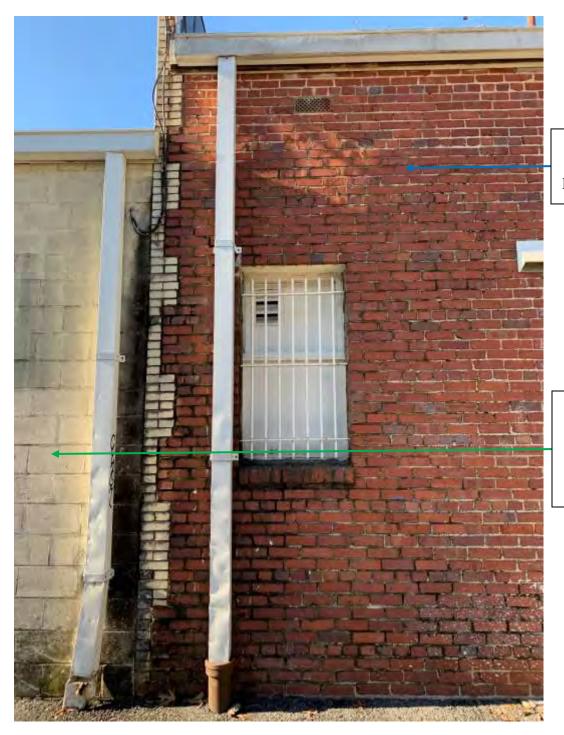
2020 Photograph (showing rear (East) elevation)
